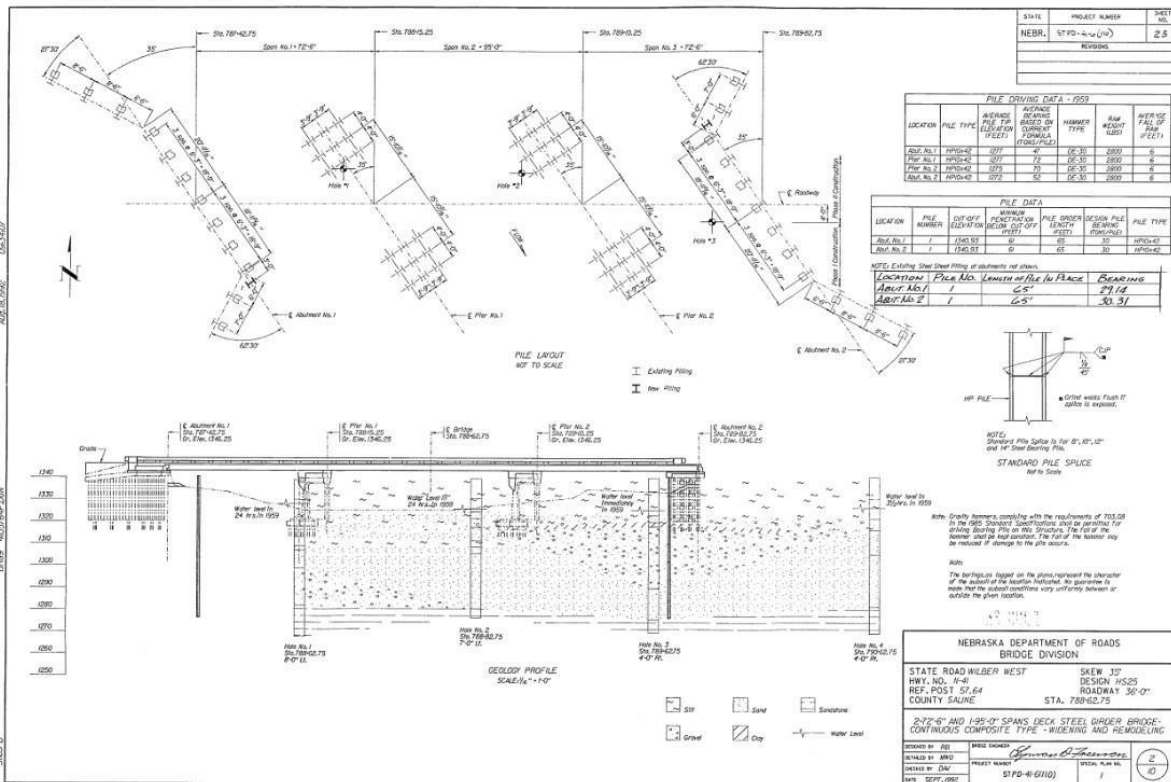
Wilber Bridge Plan (courtesy of NDOT).
